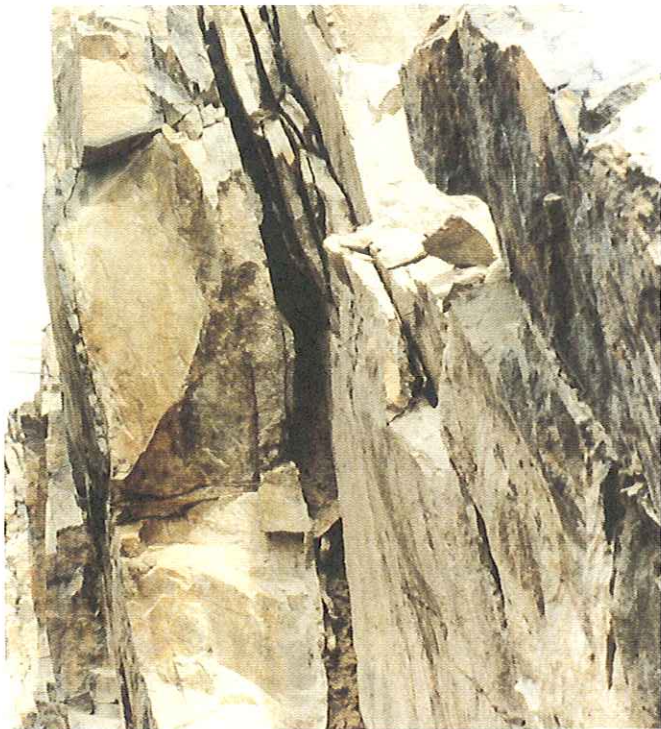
Toppling failure developing in hard bedded sandstone. Bed thickness varies. The slope was excavated very steeply so that slabs fell onto the highway.
